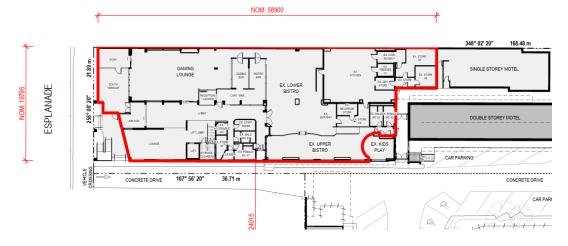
Extract of Proposed Ground Floor Red Line Plan (Insite Architects)
